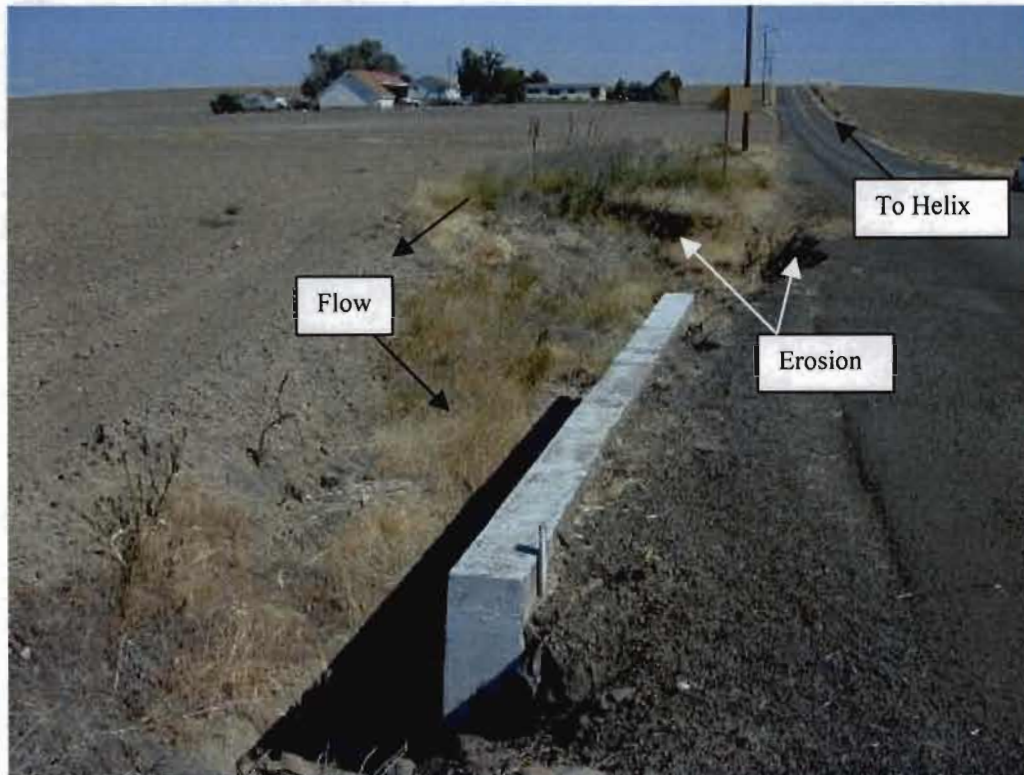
View looks at upstream side of culverts showing headwall and county road shoulder erosion caused by high water flow in creek.
